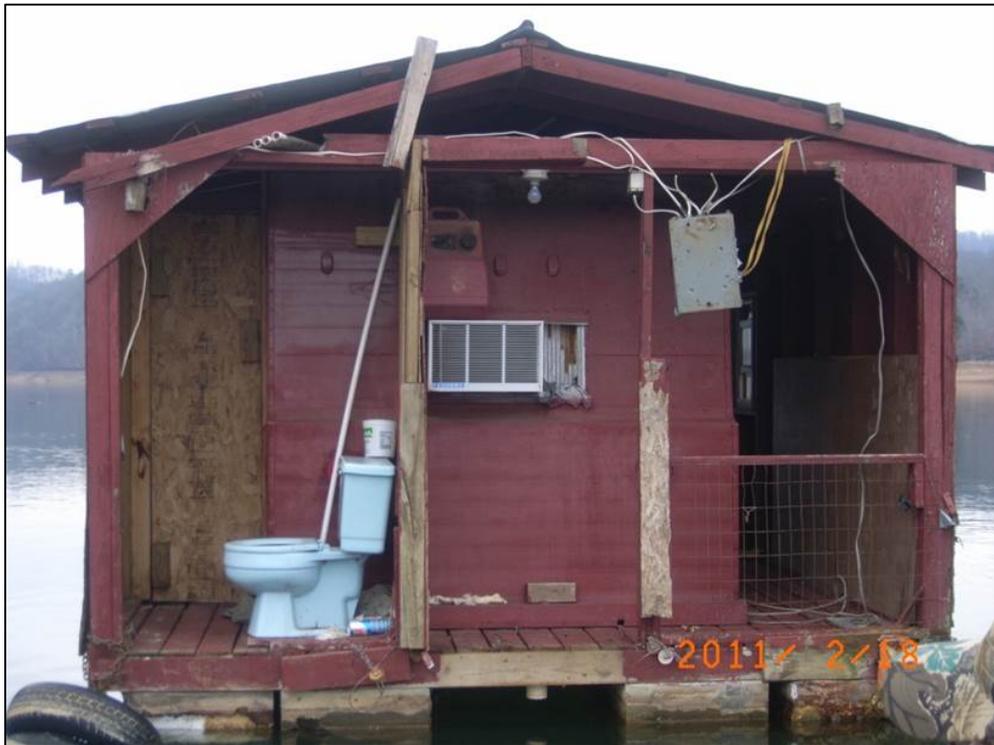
Derelict floating house with unknown wastewater disposal
